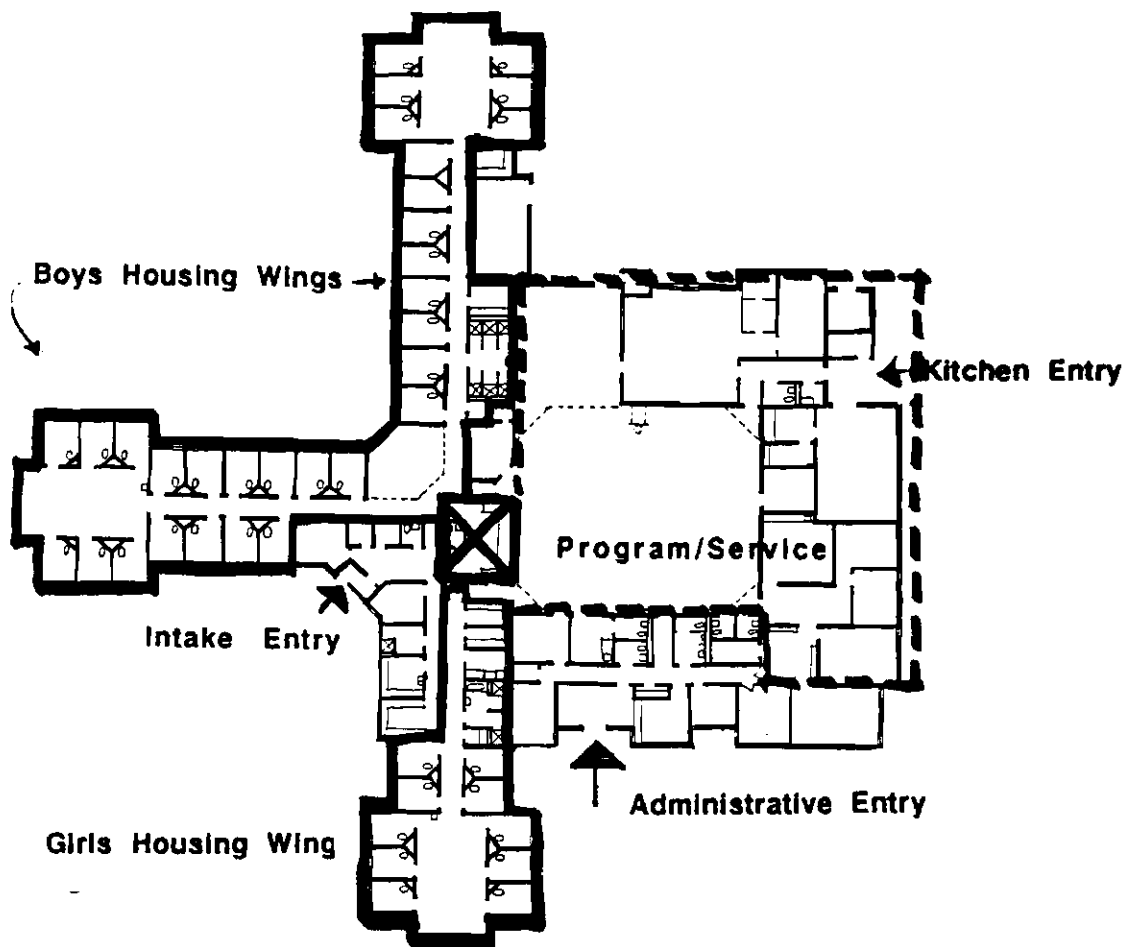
The DEK Center - Floor Plan Showing A Modified Radial Attached to a Pavilion Plan
